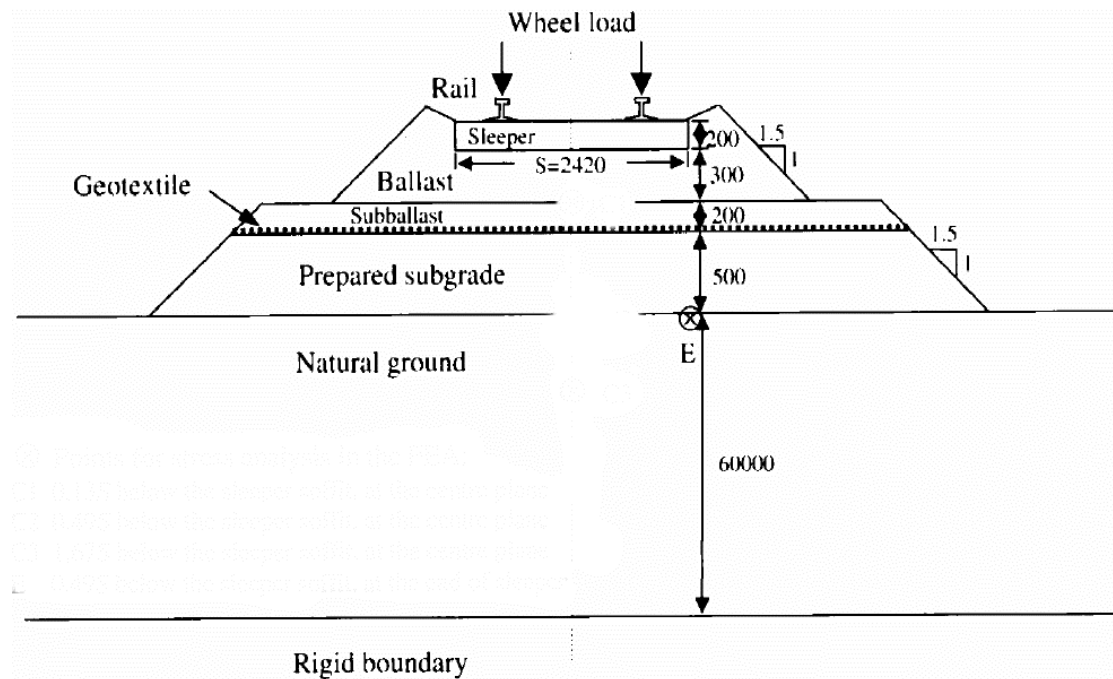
Schematic Cross-section of a Typical Track Structure (mm)
